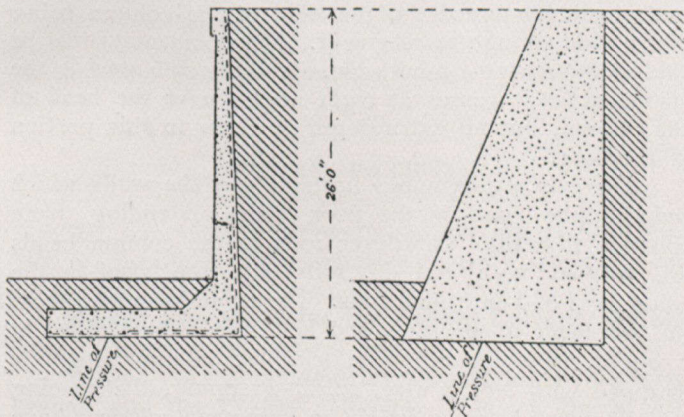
Comparison between Amount of Material required and useful space occupied in Mass Concrete and Reinforced Concrete Dock or Retaining Walls.
